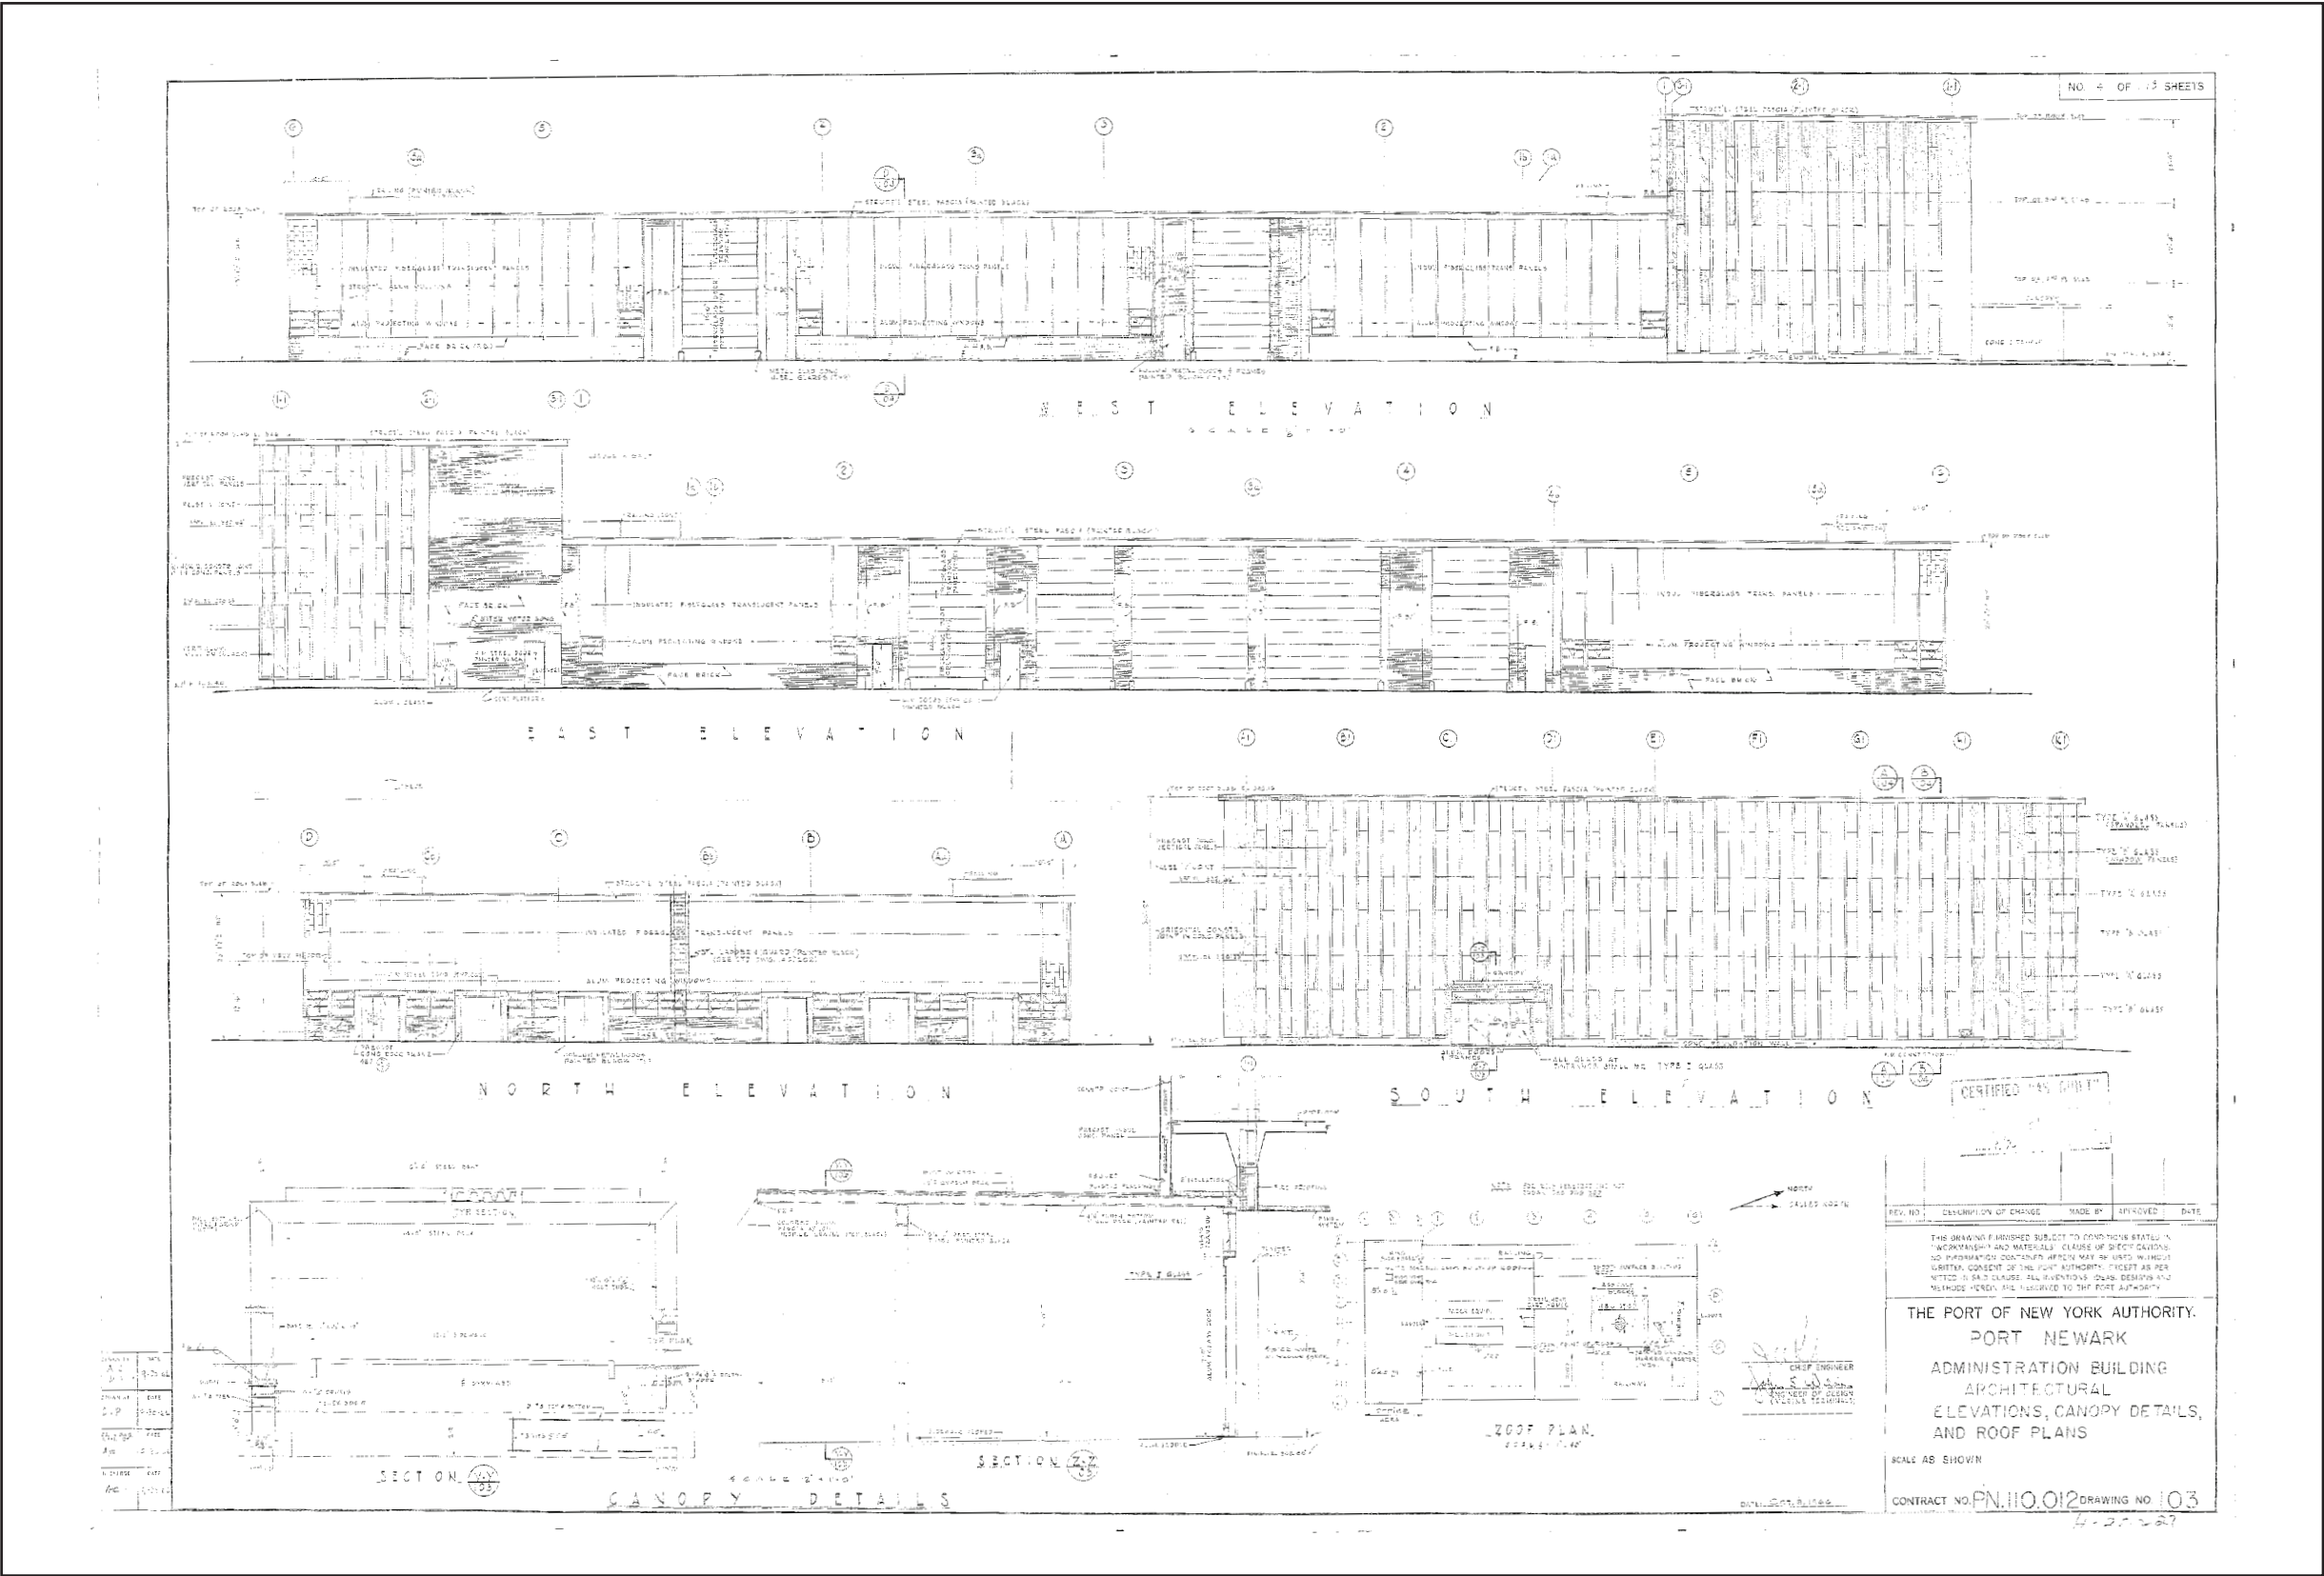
1966 architectural drawing illustrating the four elevations of the Port Authority Administration Building (Building 260) (Source: Port of New York Authority 1966).
